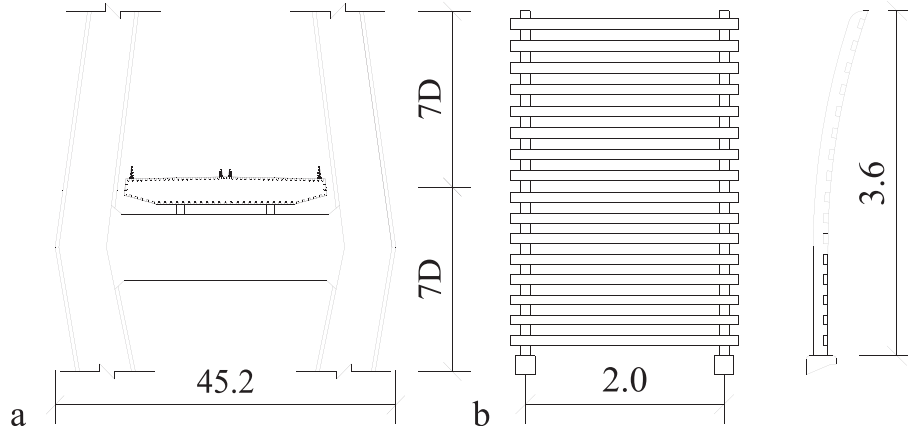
Elevation of tower segment and WSB with Pr of 10%: (a) tower segment; (b) WSB substitute treatment (Unit: mm).
